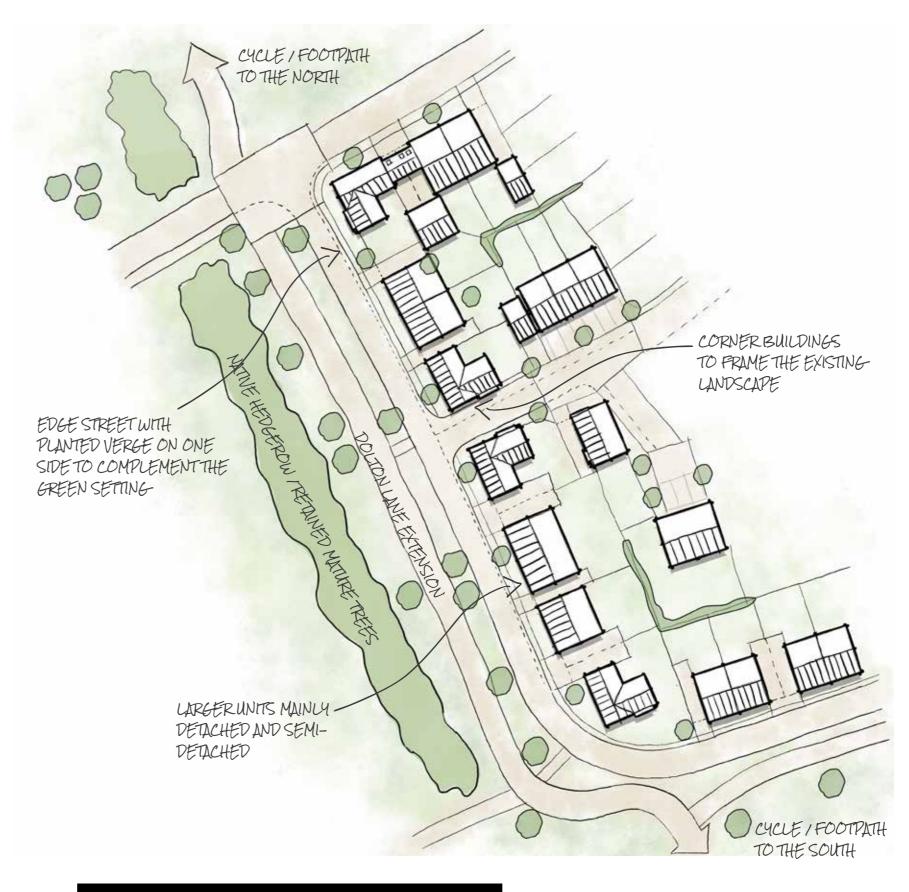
GREEN EDGE ILLUSTRATIVE PLAN
